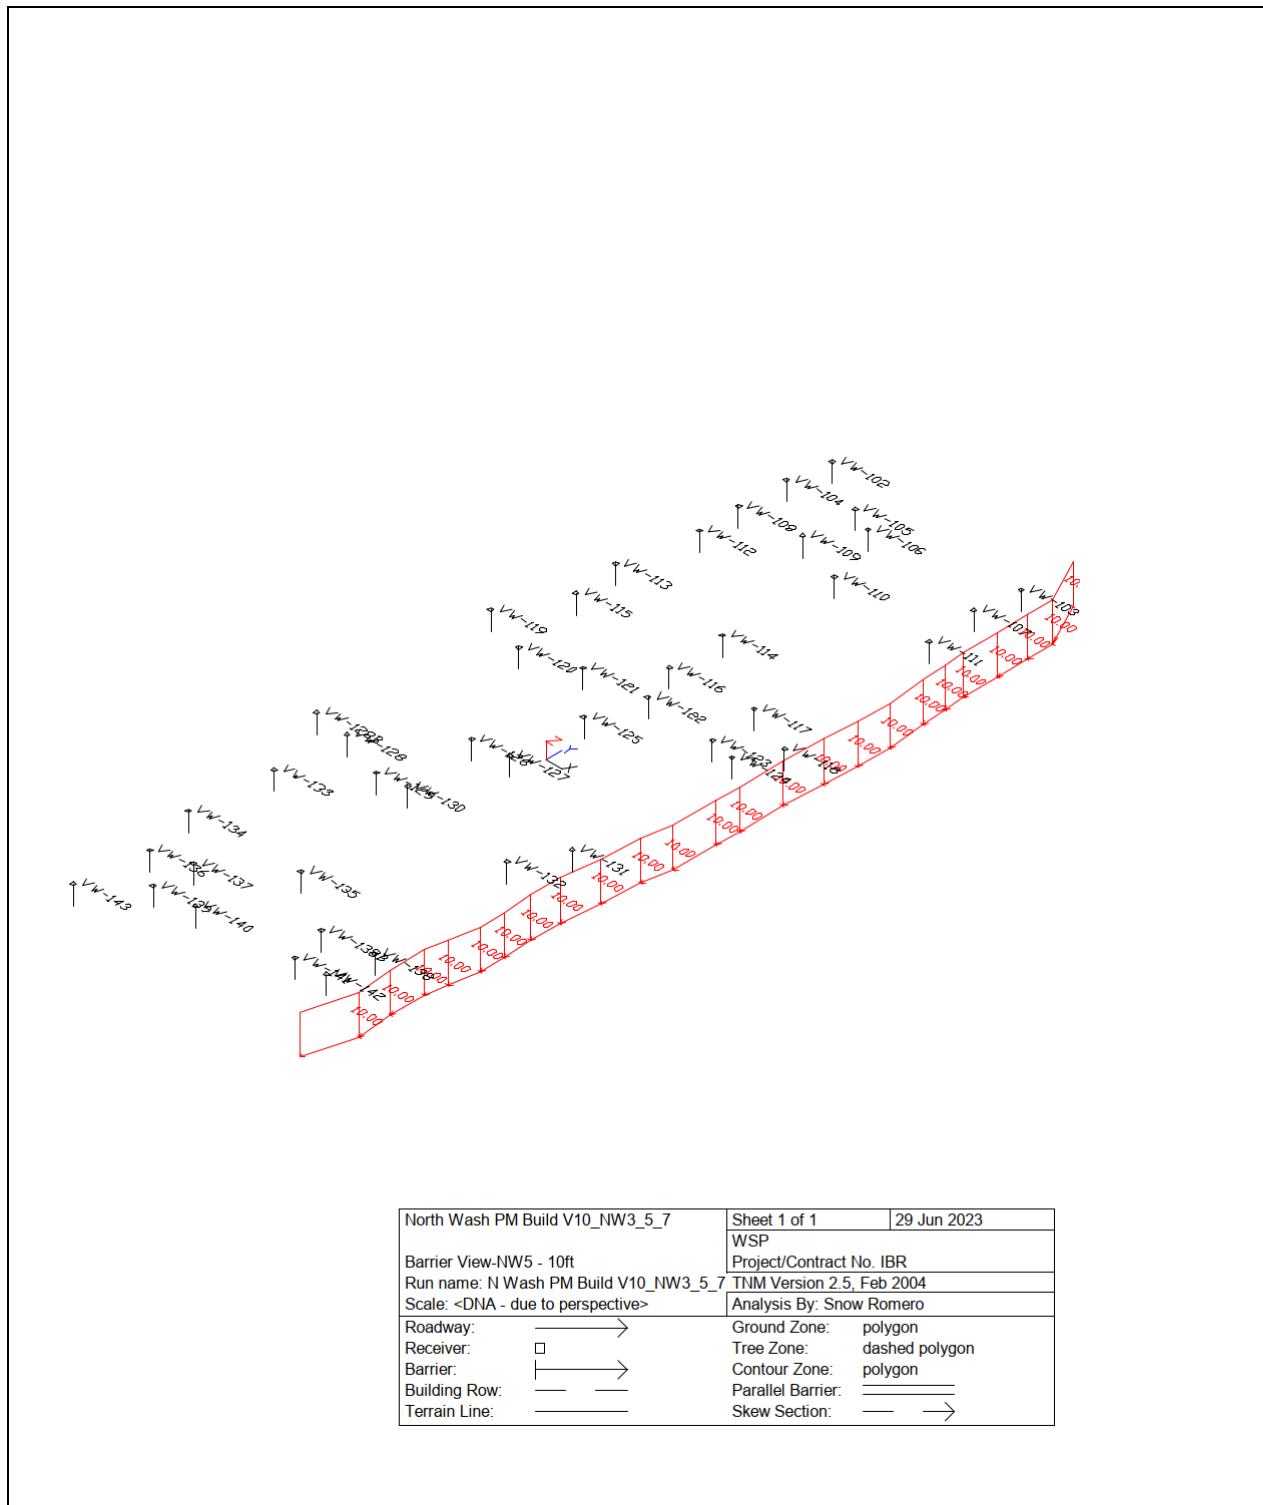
TNM Noise Wall Graphic – Noise Wall 5 (labeled Noise Wall 6 in TNM)
